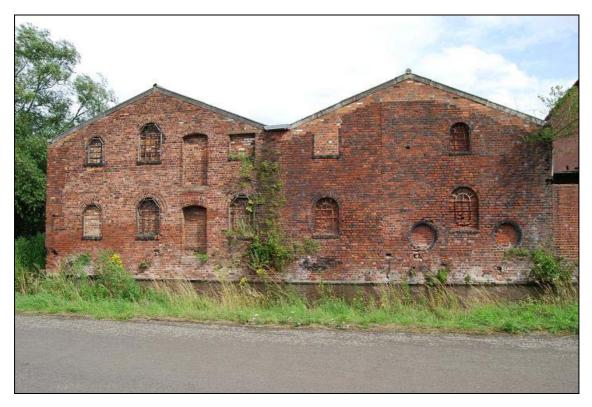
West elevation of the early 19<sup>th</sup> century former corn mill (WSM 36224; see also Plate 27)
